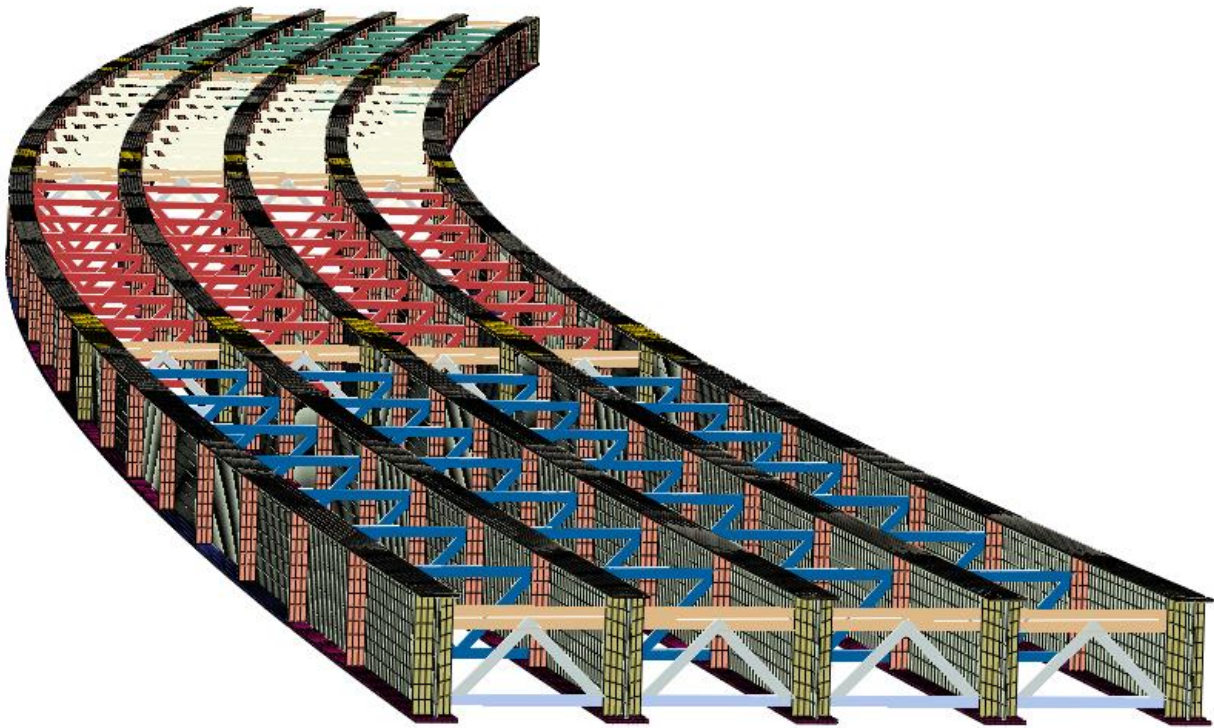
Finite element mesh of the girders modeled with shell elements and cross framings modeled with beam elements.
